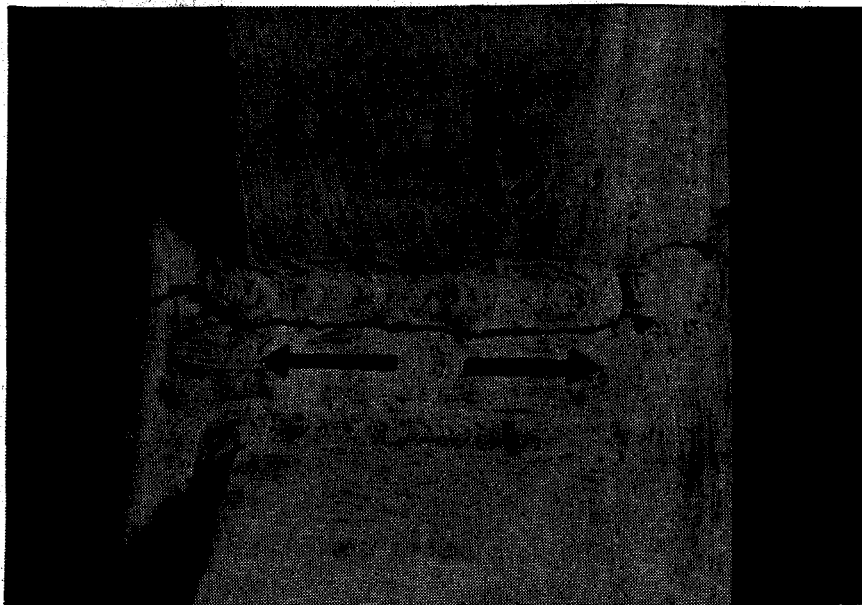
Fatigue Crack in Joint L1 (T8F)
